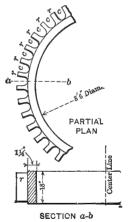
Partial plan and section of Schwarz kiln. (Engineering News.)
